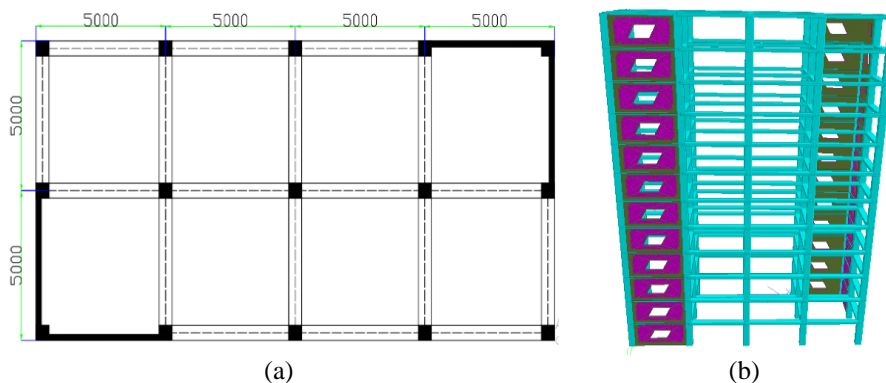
(a) Plan view of building in millimeter (mm), and; (b) side view of building
